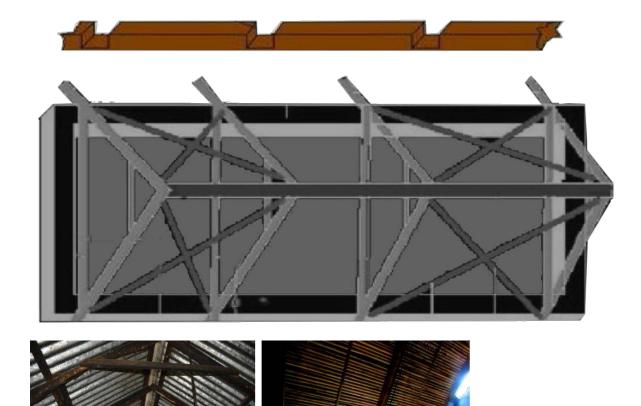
Above: 3d modeling of grooves for the placement of rafters in ring beam. Middle: 3d model of diagonal braces in between rafter, left below: use of collar beam at case study 3 and ceiling made of bamboo weaving over palm wood beams at case study 2
